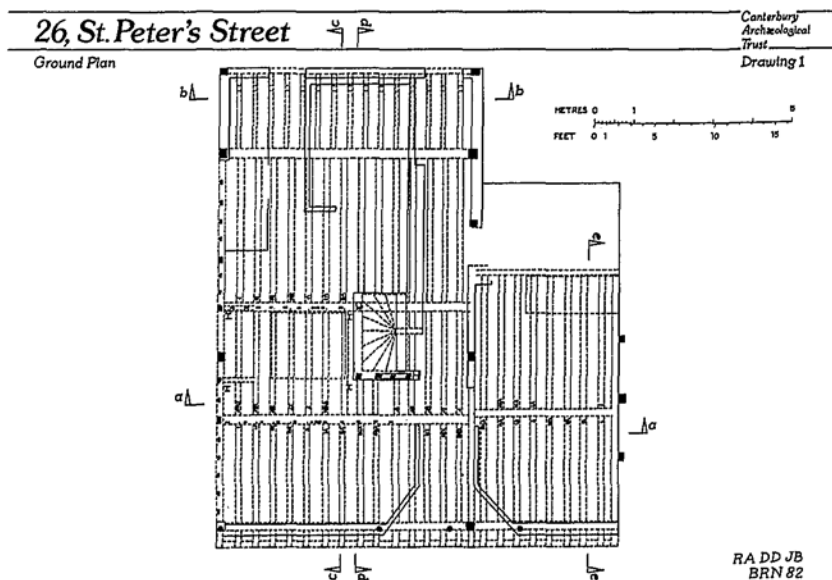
No. 26 St. Peter's Street: Ground Plan (Scale: 1:200).
